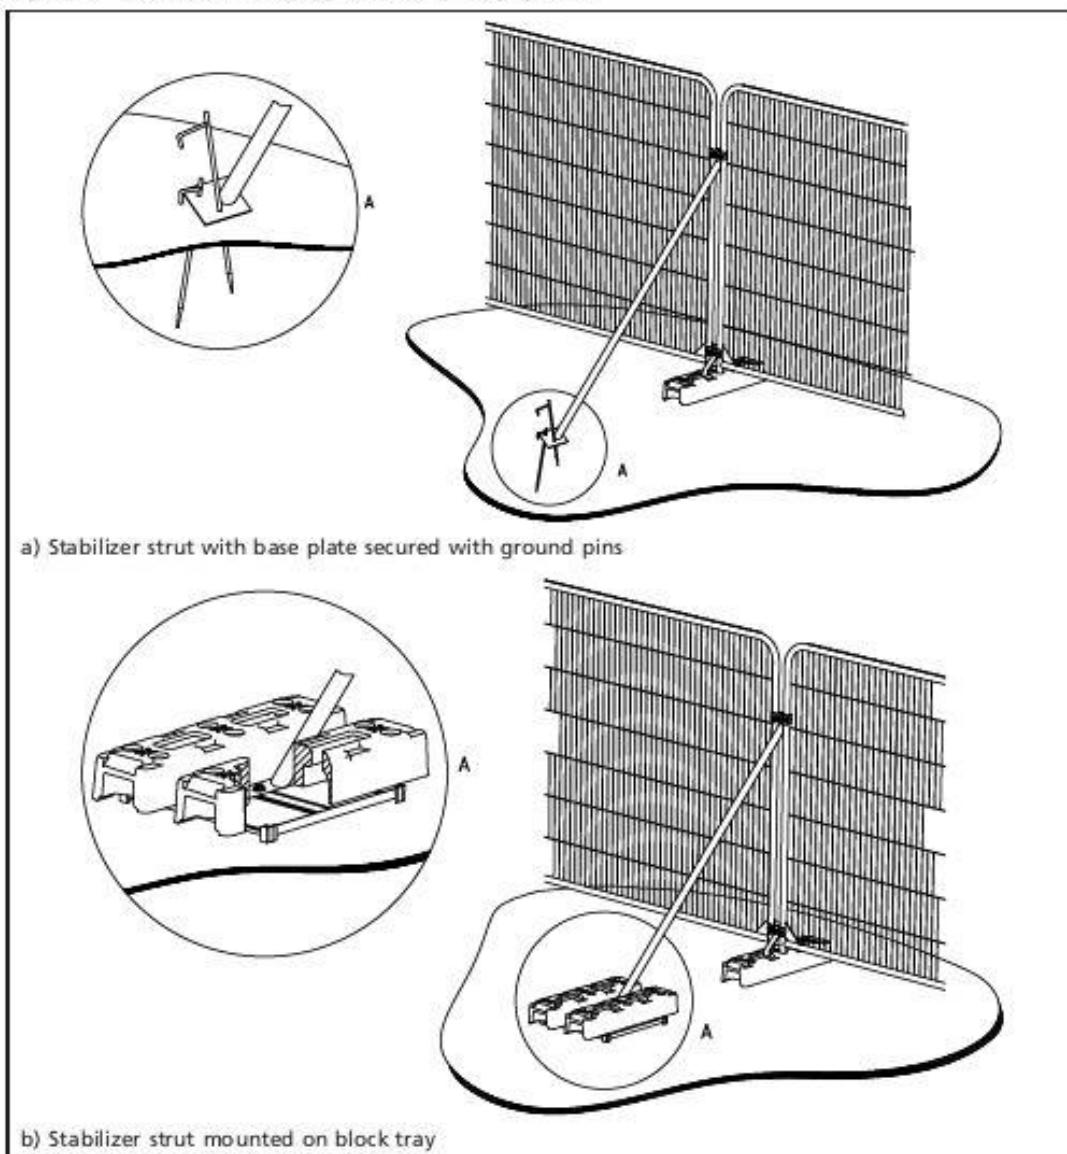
BS5837 - Protective fencing, above-ground stabilizing system. Image sourced from BS5837: Trees in relation to design, demolition and construction - Recommendations.
